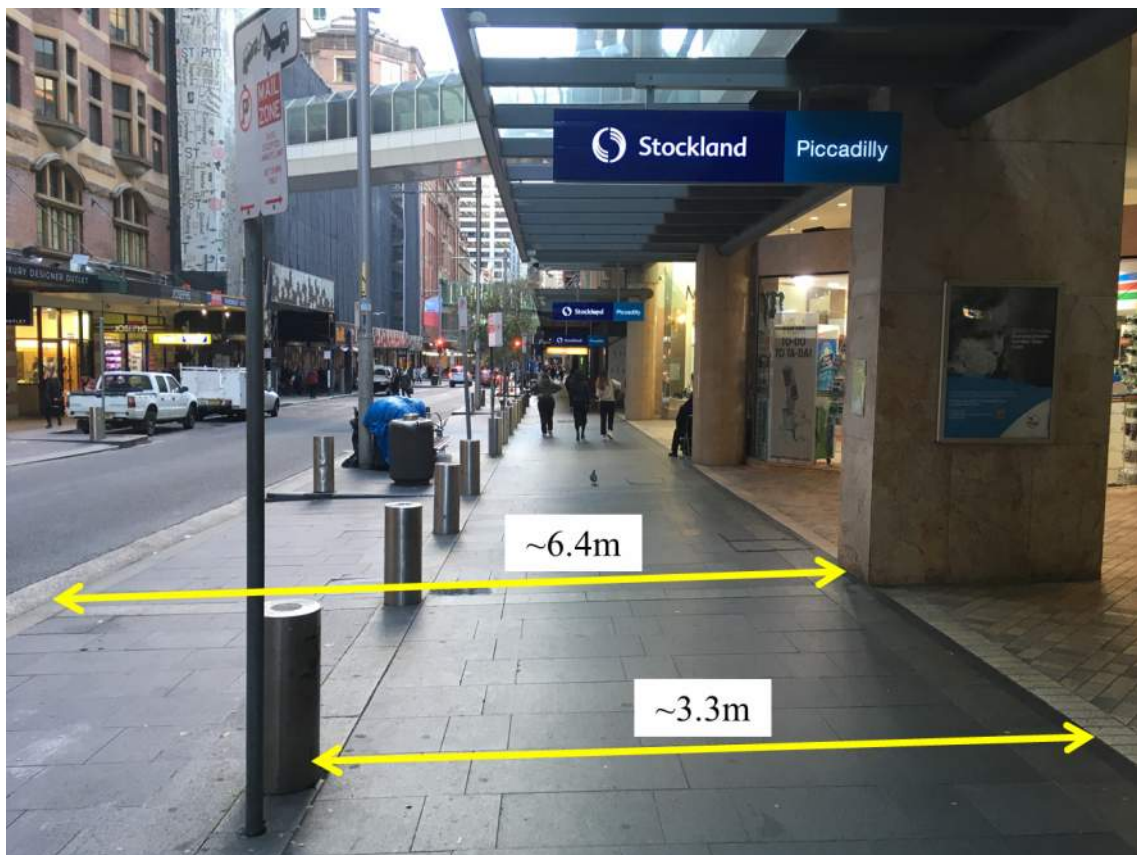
Castlereagh Street, looking north, adjacent to proposed development site
